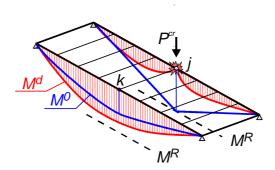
Redistribution of bending moments in a 2-girder structure at failure in section *j
